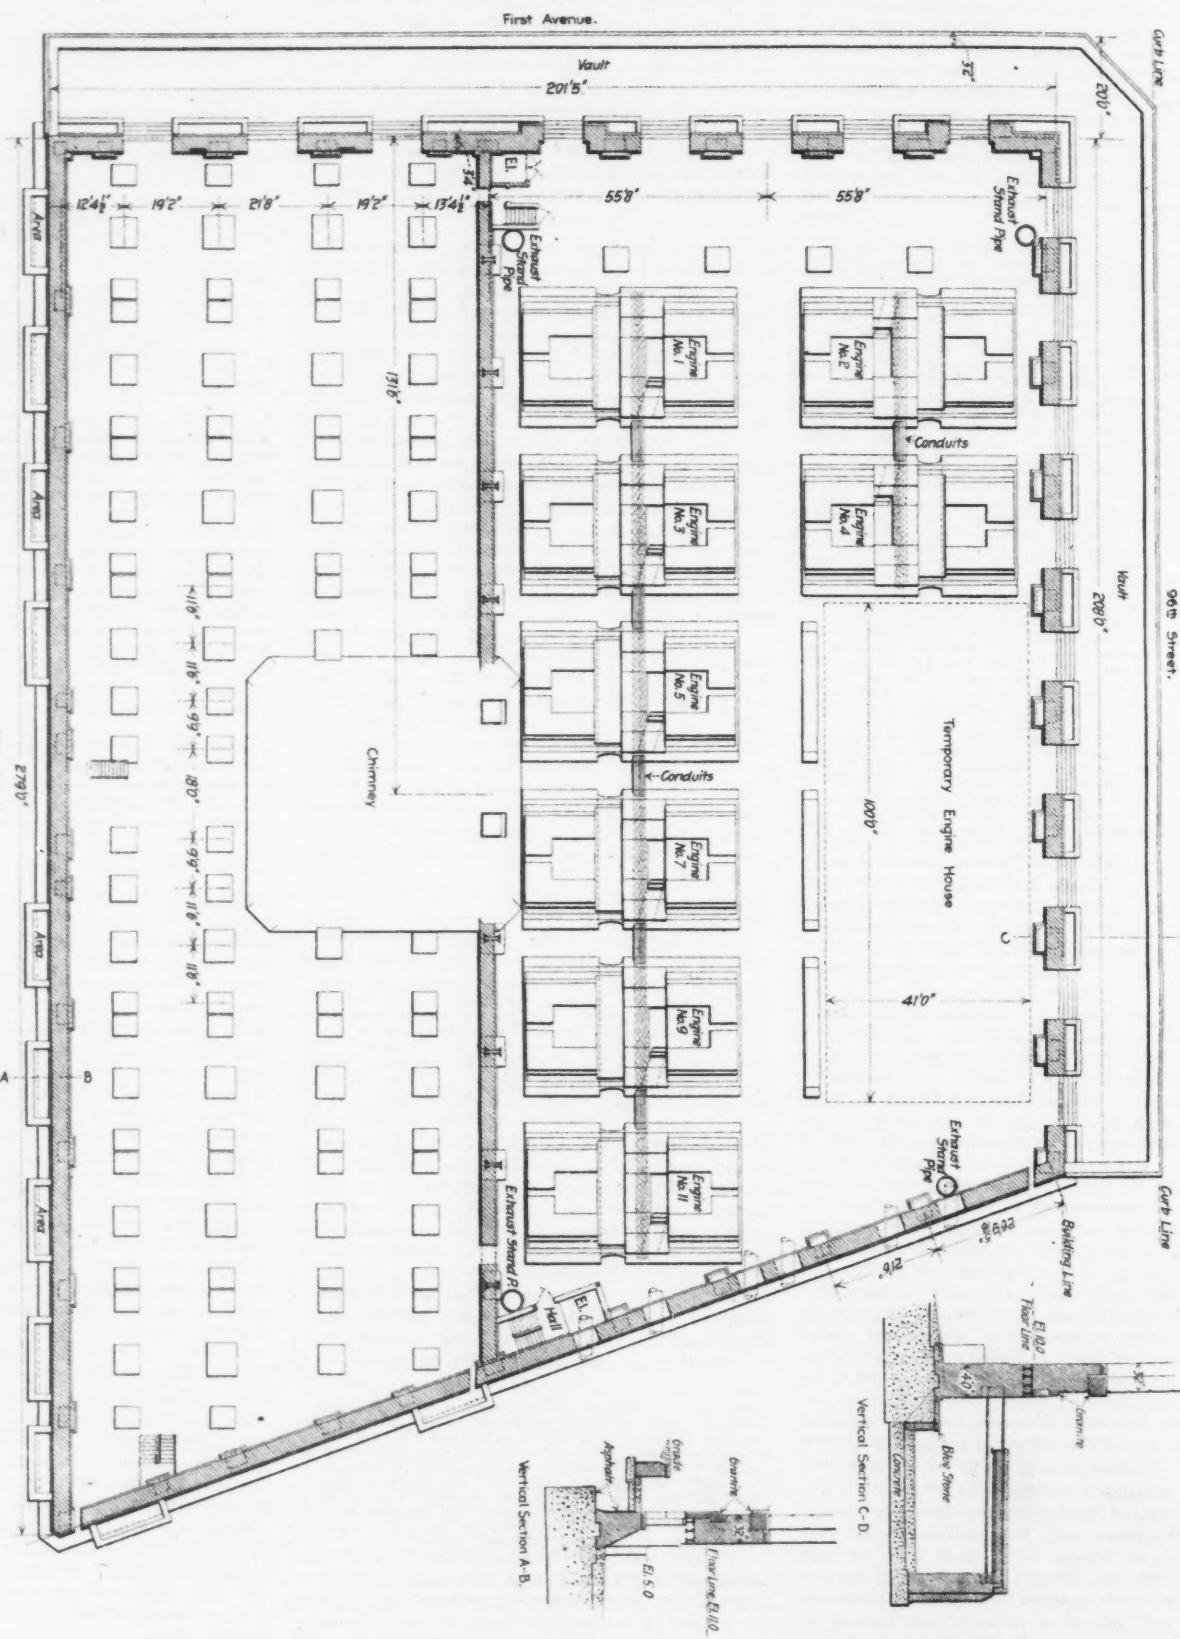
GENERAL PLAN OF FOUNDATIONS FOR ENGINES AND COLUMNS SUPPORTING BOILERS AND COAL STORAGE BIN.
